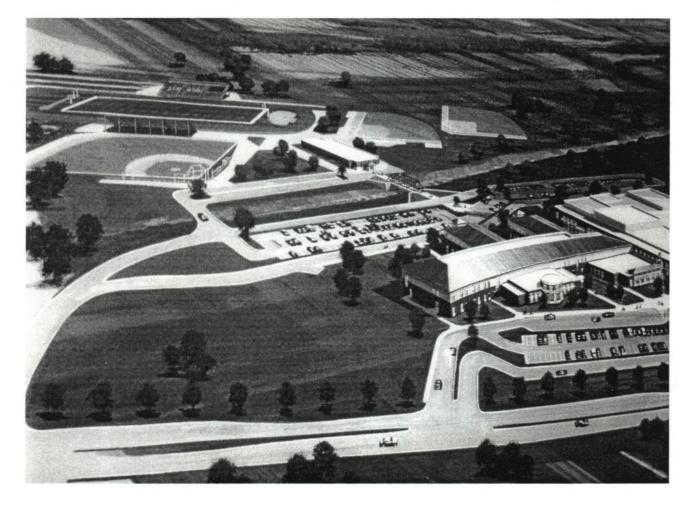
View from athletic area toward academic area (facing west); showing ESA extending to right of bridge area
